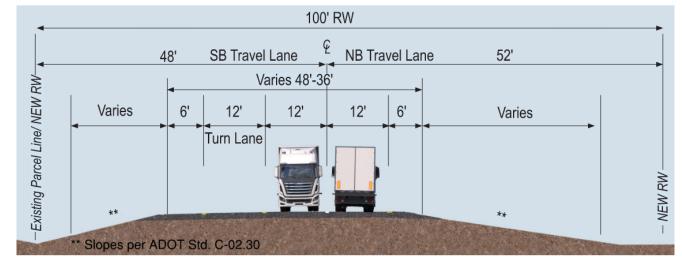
Typical Section – Extension to GSA Parking Lot
